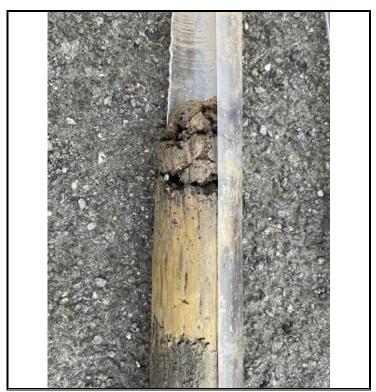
/1055/R2/P61 – Window Sample WS5 – Core 2.0 to 2.3m bgl.
